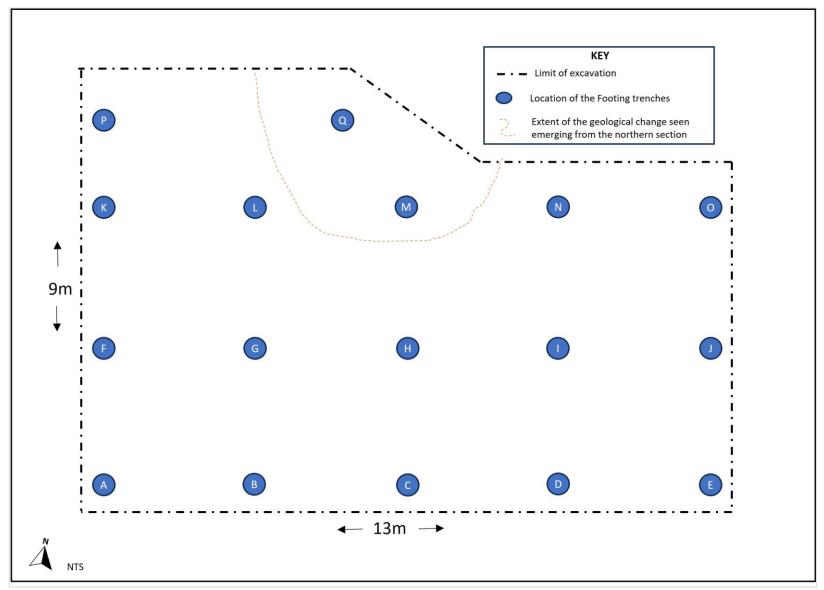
Sketch plan of the excavation showing the location of the footings trenches A-Q.
